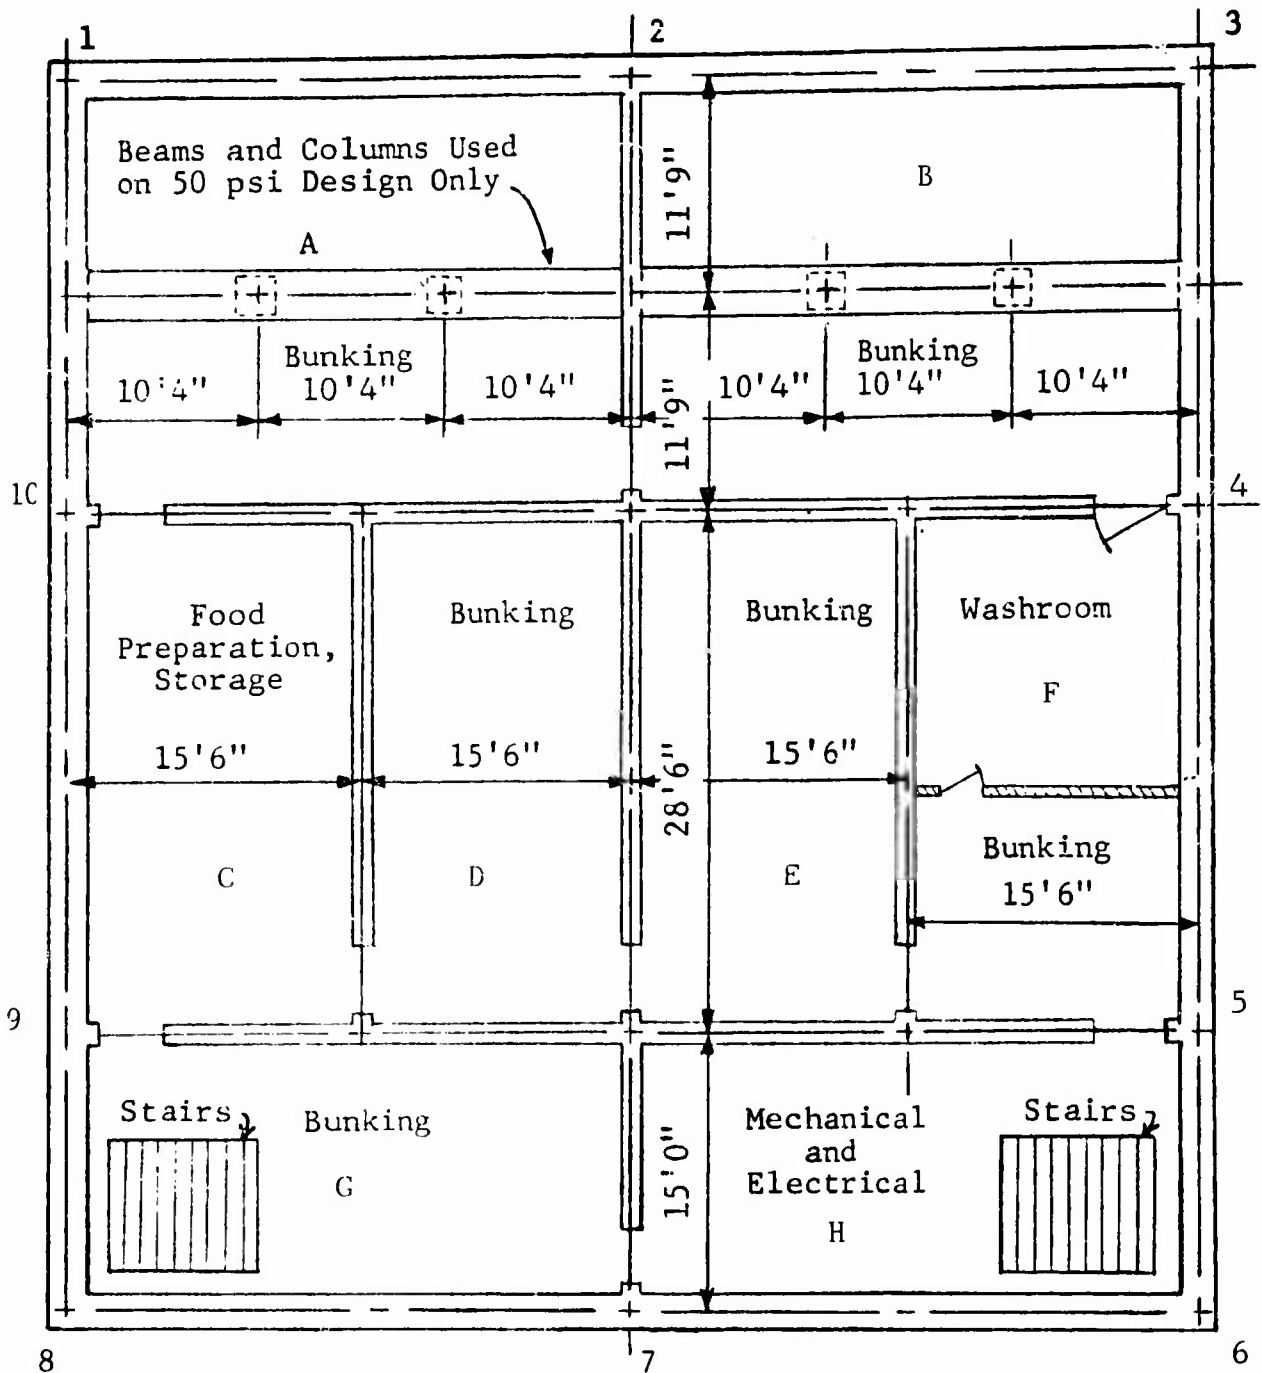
UPPER LEVEL FLOOR PLAN
